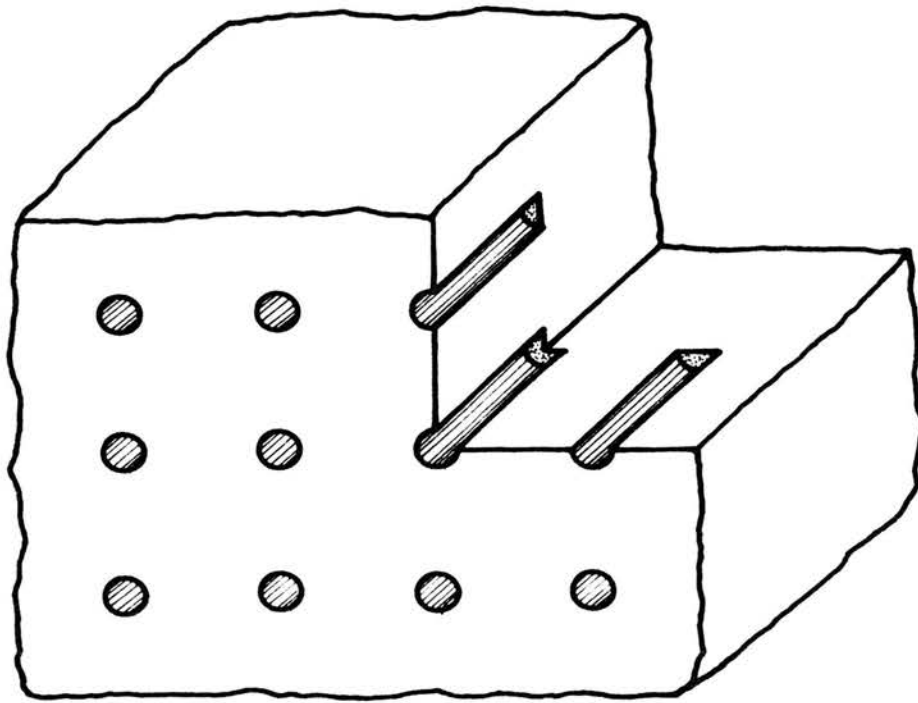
THREE DIMENSIONAL HOLE CONFIGURATION
